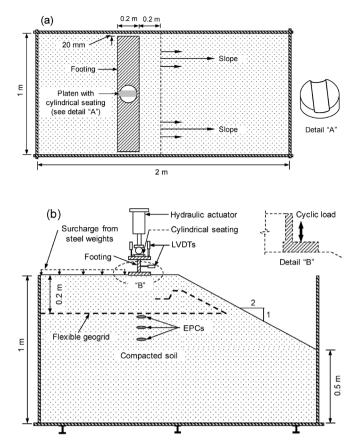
Model footing testing arrangement; (a) plan view and (b) elevation.
